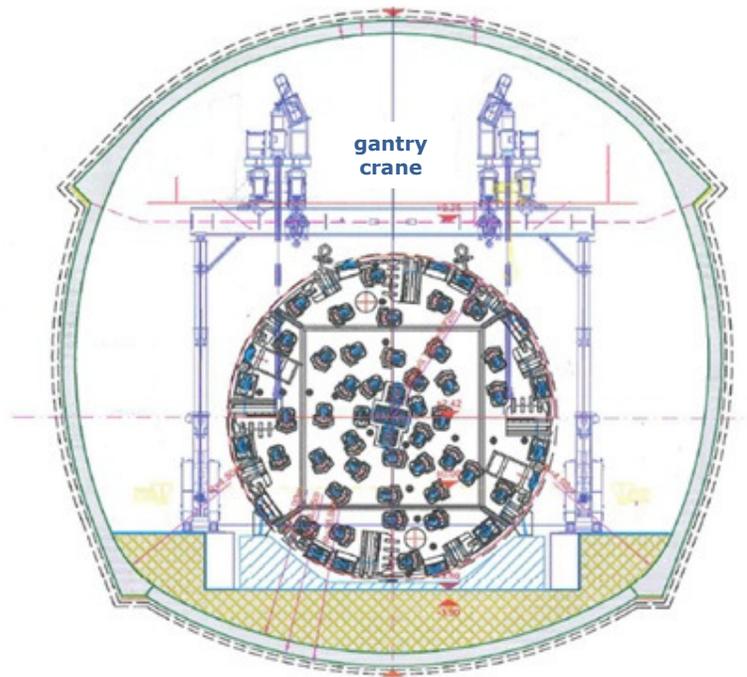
The assembly cavern with a view of the gantry crane and the TBM head.
